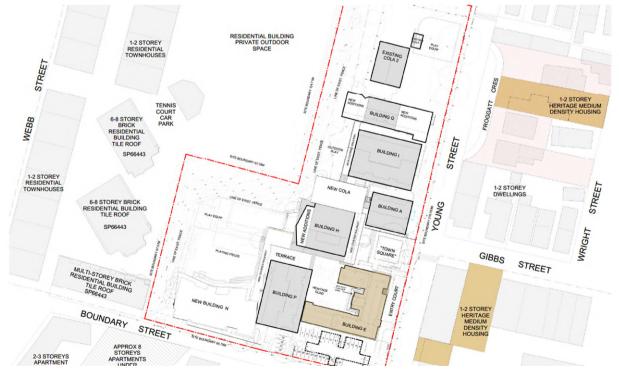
Site and Neighbouring Context Plan (Source: DFP Planning, February 2019)
